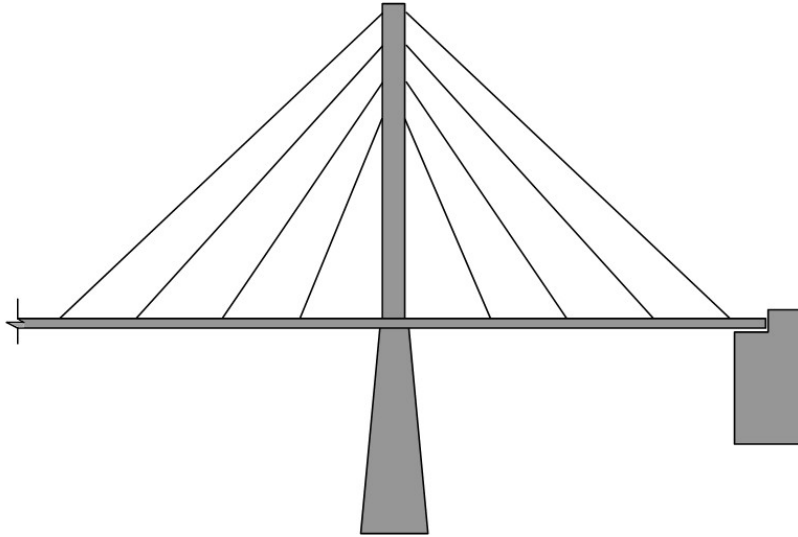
Fan or Intermediate Cable System Schematic
